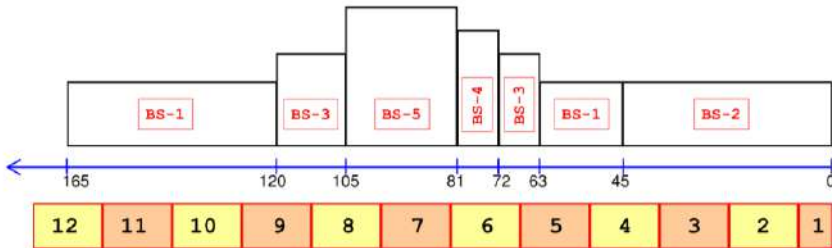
Half bridge sections and segments arrangement (Box size represents I_y approx.)
